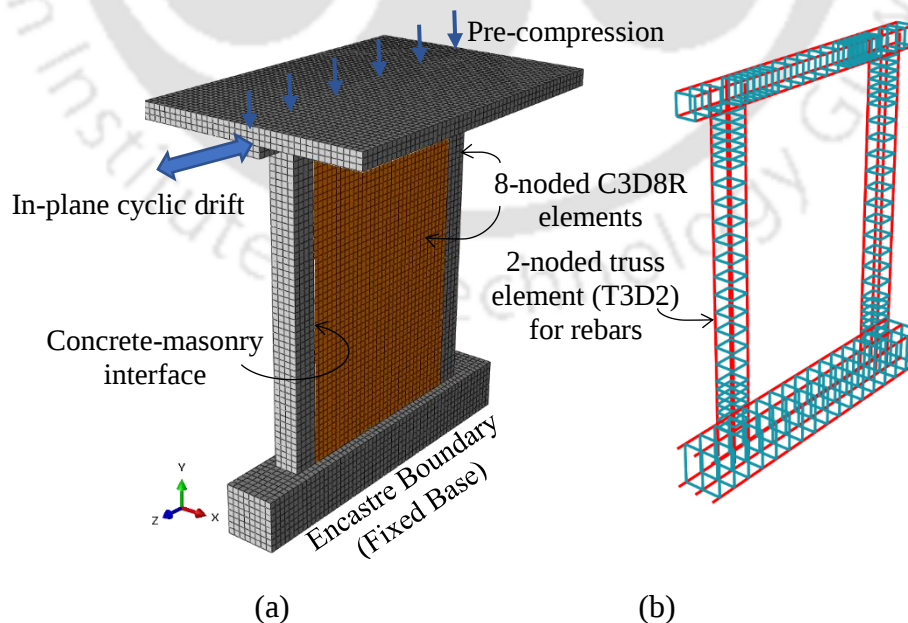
Schematic of a typical FE model representing various elements, loading, boundary conditions, interface, and constraints for the walls: (a) concrete and masonry elements, and (b) Embedded steel reinforcement.
